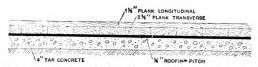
Double Floor Bedded in Roofing Pitch on a Base of Tar Concrete.
